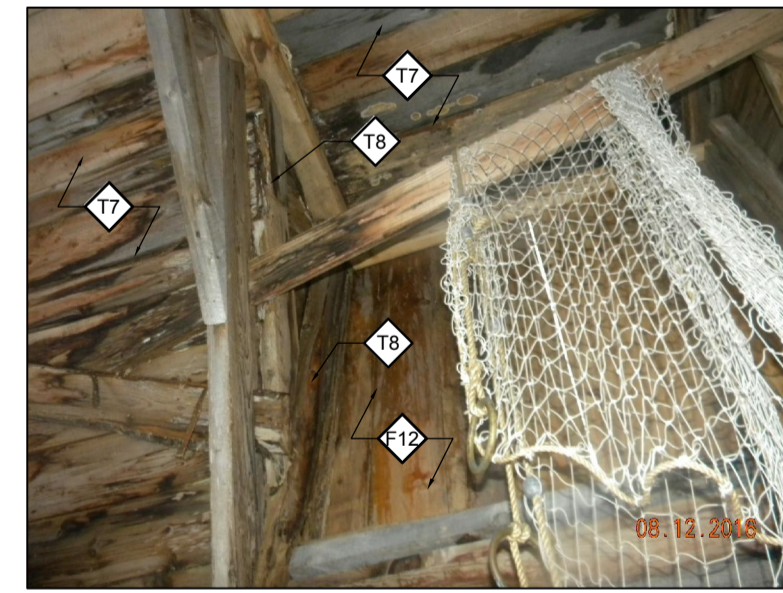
ROOF SUPPORT BOARD AND FRAME TO REPLACE AROUND THE WINDOW DORMER.
